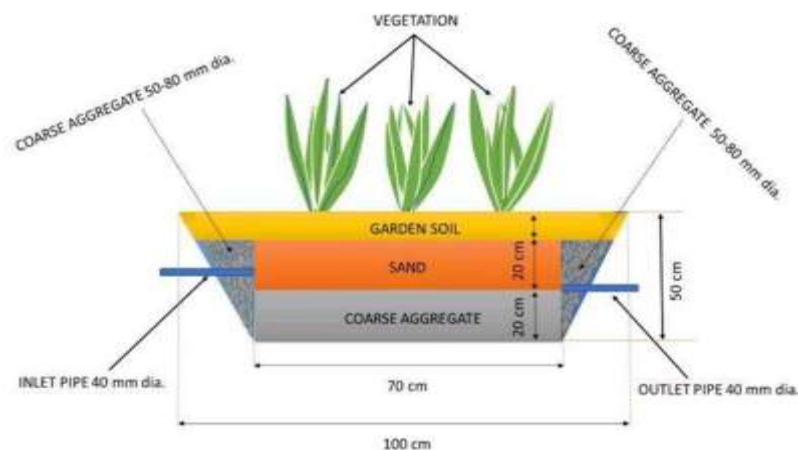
Schematic layout of a pilot-scale hybrid constructed wetland unit showing substrate layers, inlet/outlet configuration, and vegetation setup
